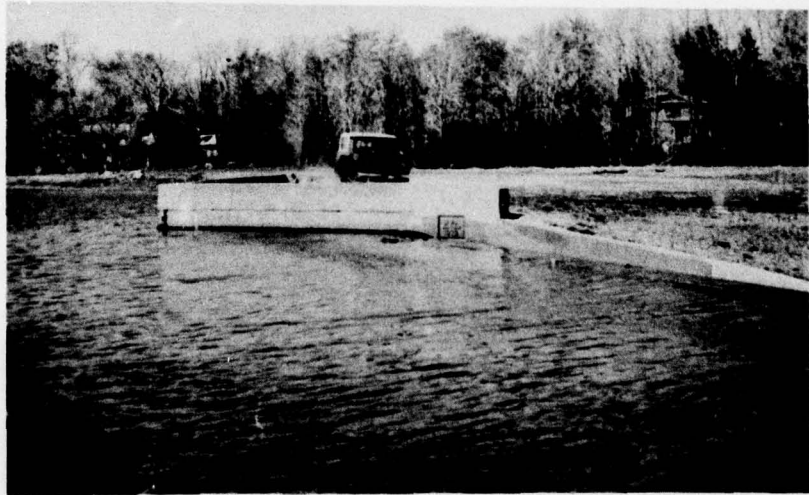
View of the right abutment area overtopped on November 7, 1977, looking across the ungated weir crest and at the upstream abutment wing-walls
